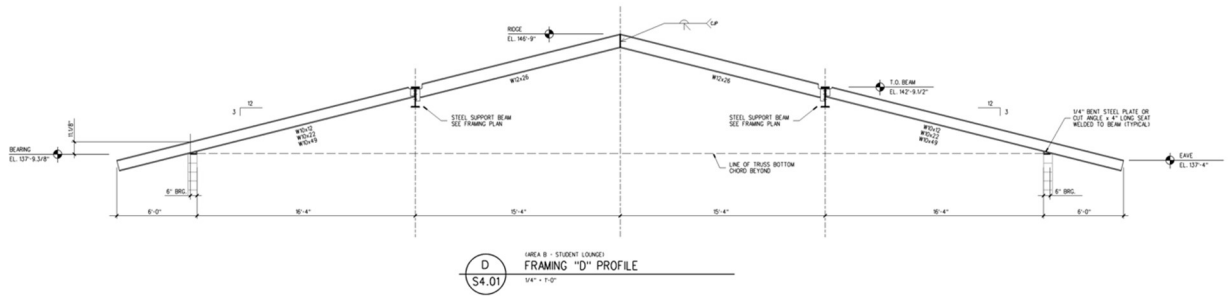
Framing Plan D Profile for CFAC Roof 5.
